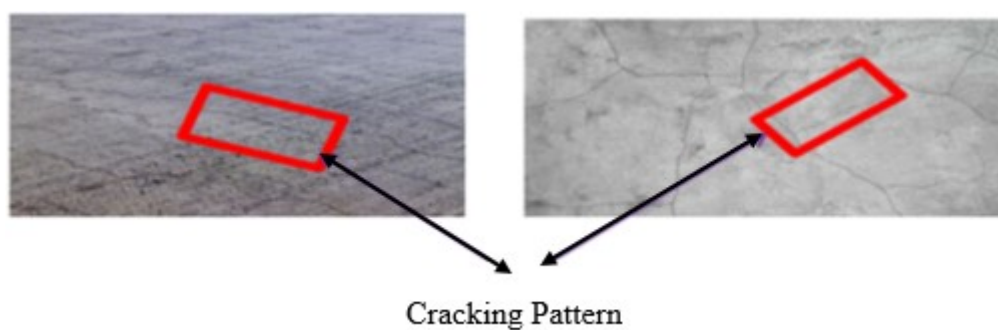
Cracking in Rigid Pavement [25]
